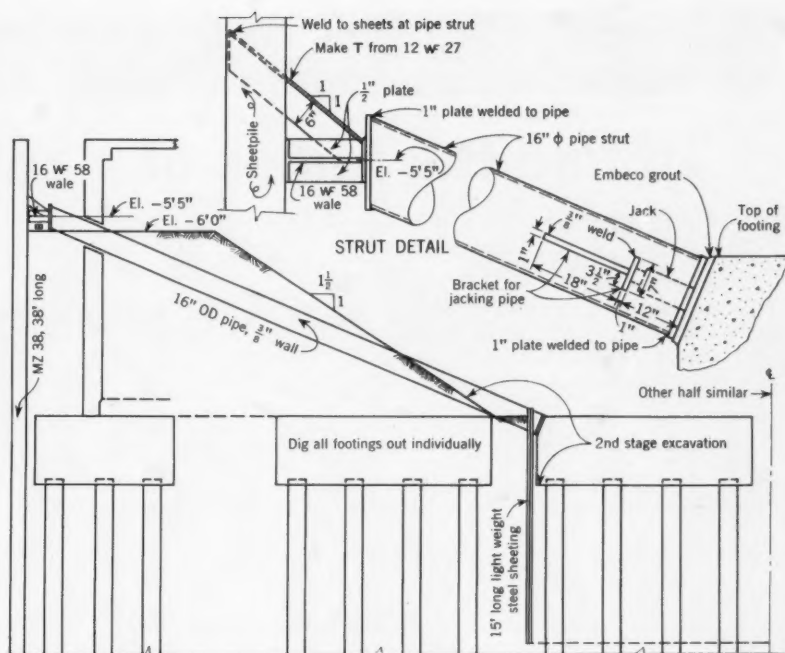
Stage construction was used for economical excavation of basement area for New Orleans' tallest building. Stage 1 was general lot excavation to El. -6. Stage 2 cleared center for core concrete and Stage 3 complete the operation.
